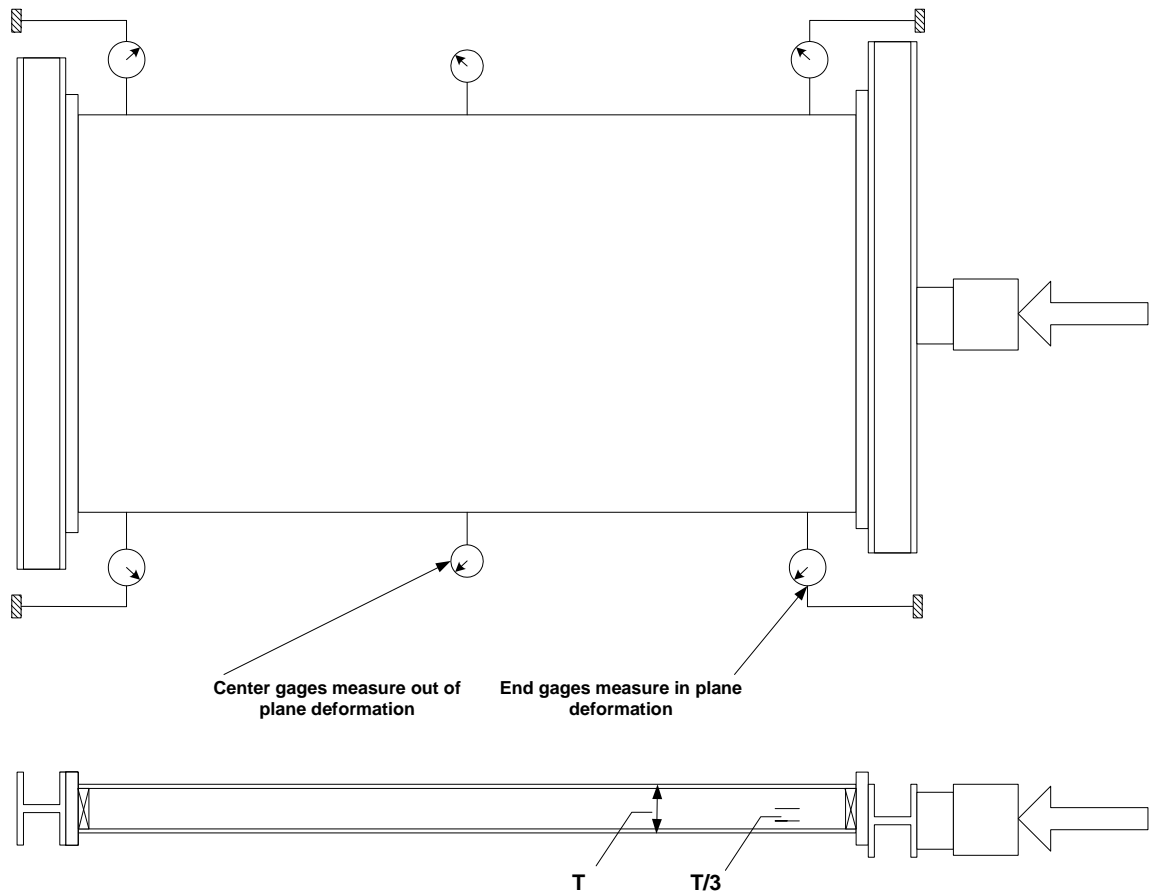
AXIAL (COMPRESSION) LOAD TEST ASSEMBLY
